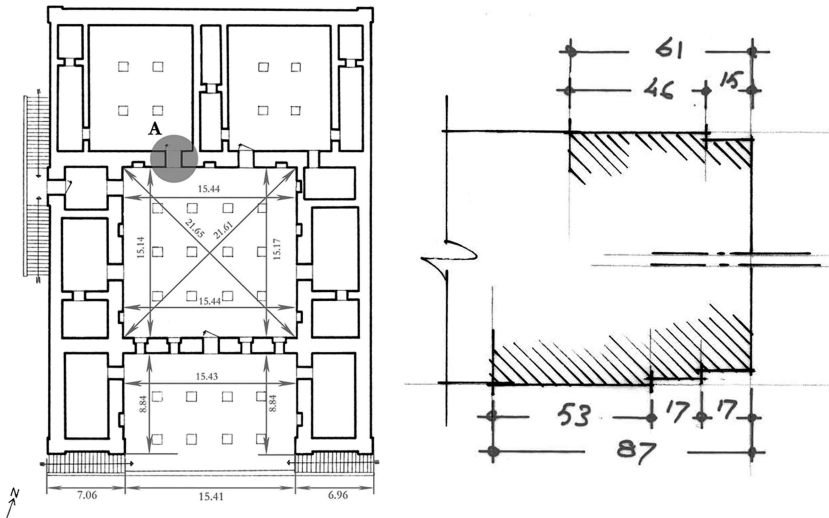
Palace of Darius, floor plan measurements, and dimensions of the moldings of the western doorway of the north wall of the central hall (right) detail (A)
